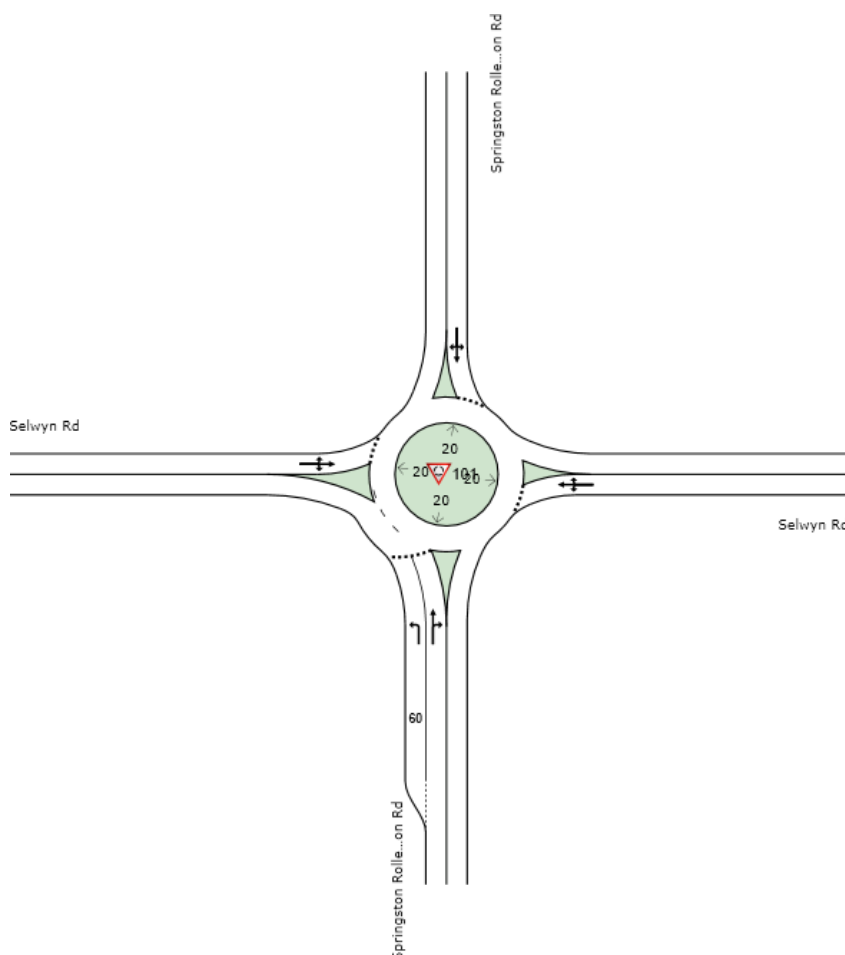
SIDRA modelled layout – Selwyn Road/Springston-Rolleston Road (alternative layout)
